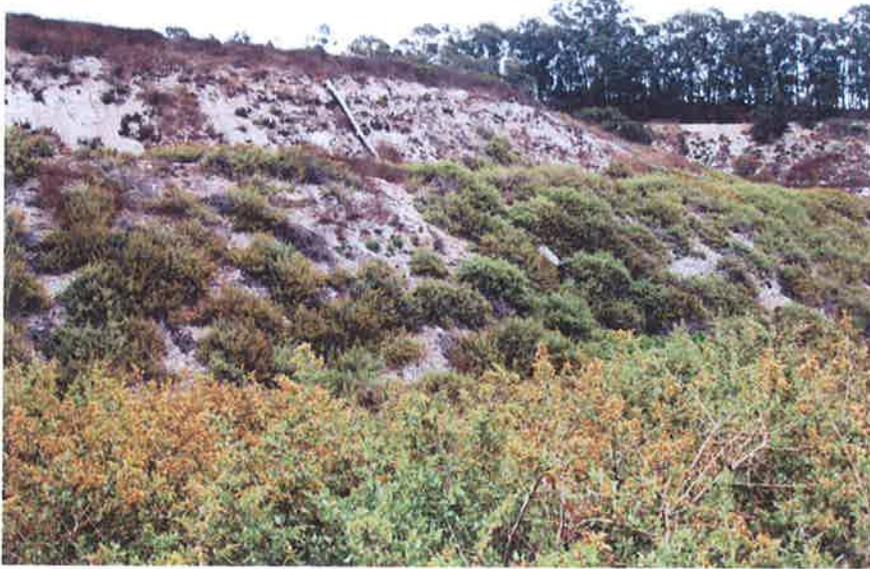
From section C-04, looking north towards the bluff and existing cuts south of sections C-02 and C-03.
